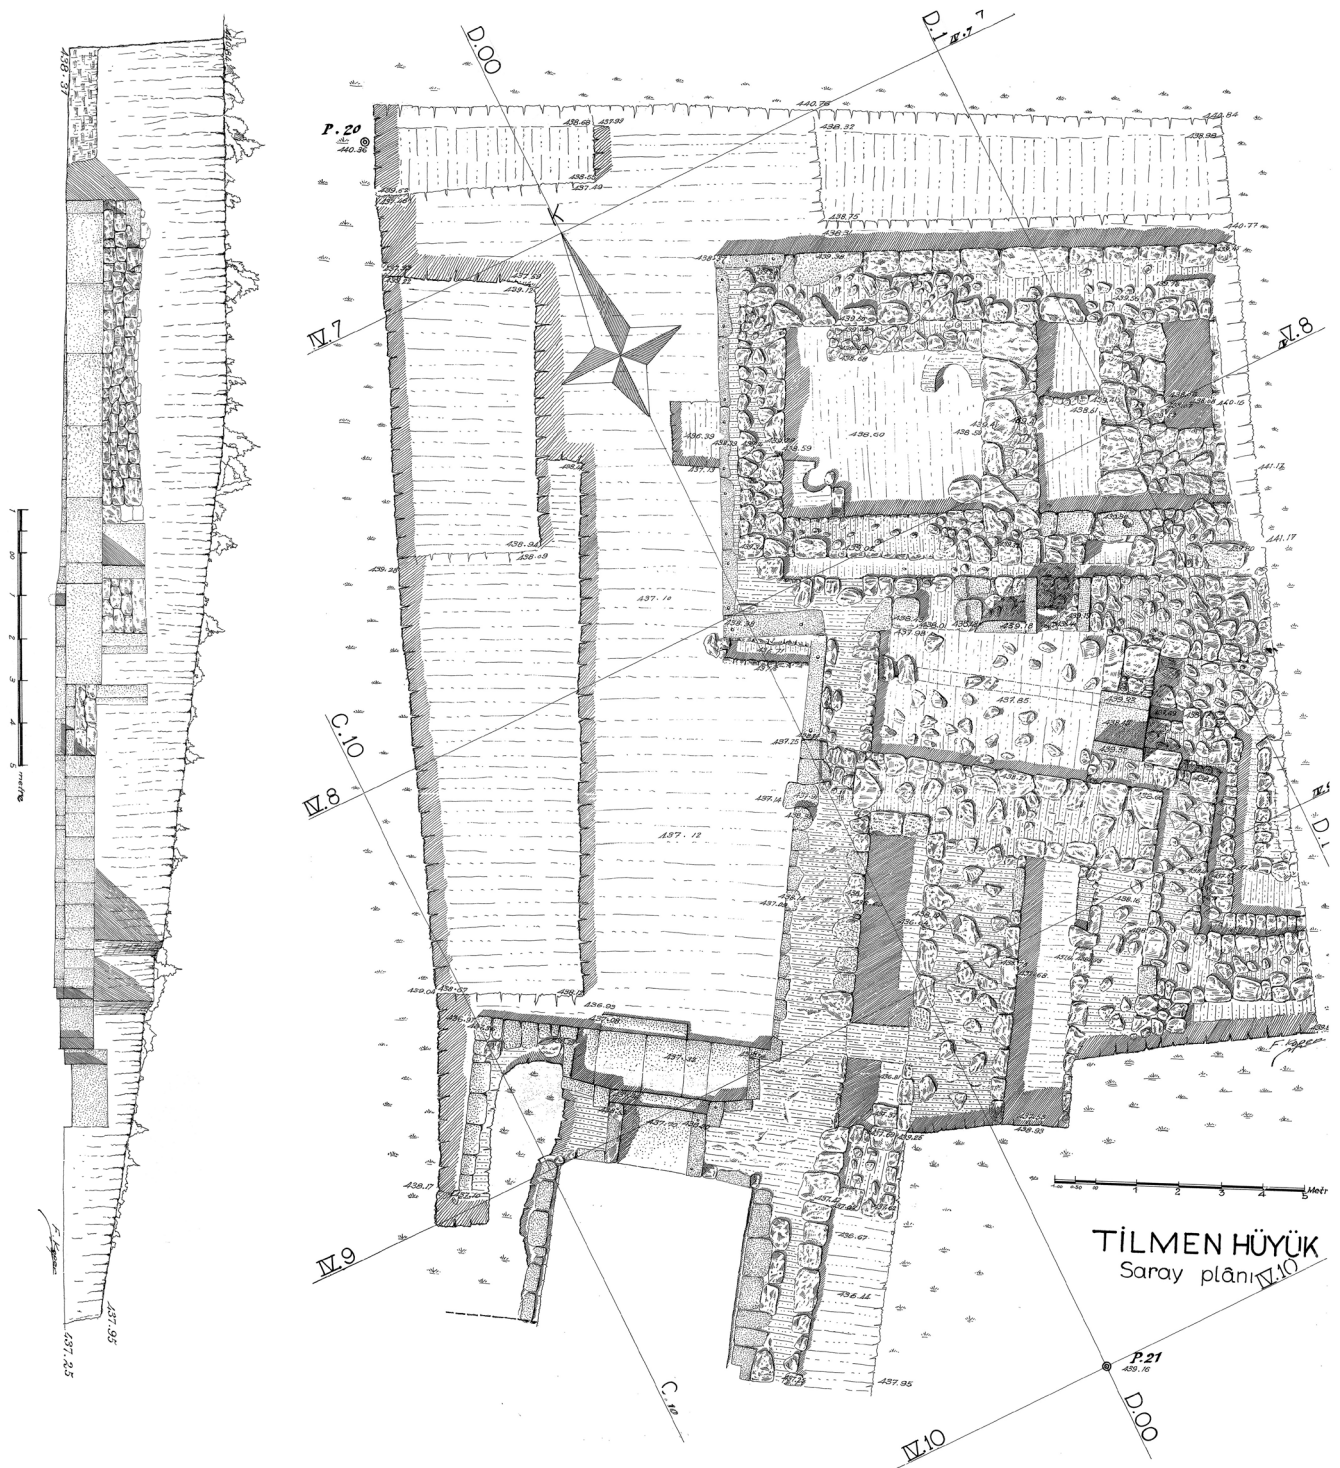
Elevation and plan of Buildings A and B in the early phases of the excavations.
